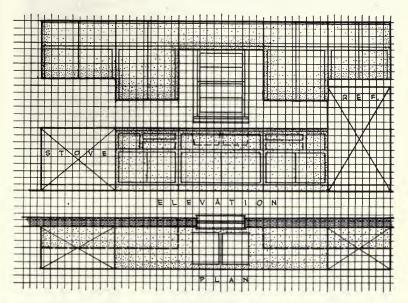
Planning sketch, showing wall elevation and floor plan on cross-ruled paper.
